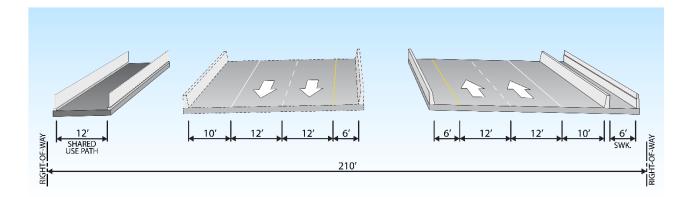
Preferred Alternative Typical Section Flint Creek and Flint Creek Relief Bridges
